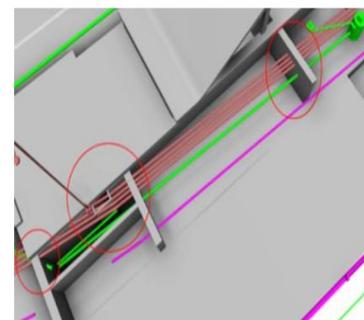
Clash between wall (structure) and plumbing (MEP) [20]
